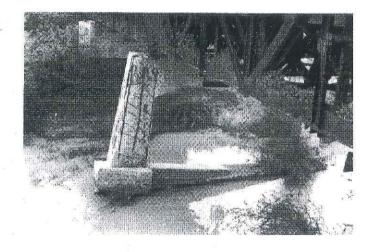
Mifoli bridge.It's looking to north and shows the siking of its pier
